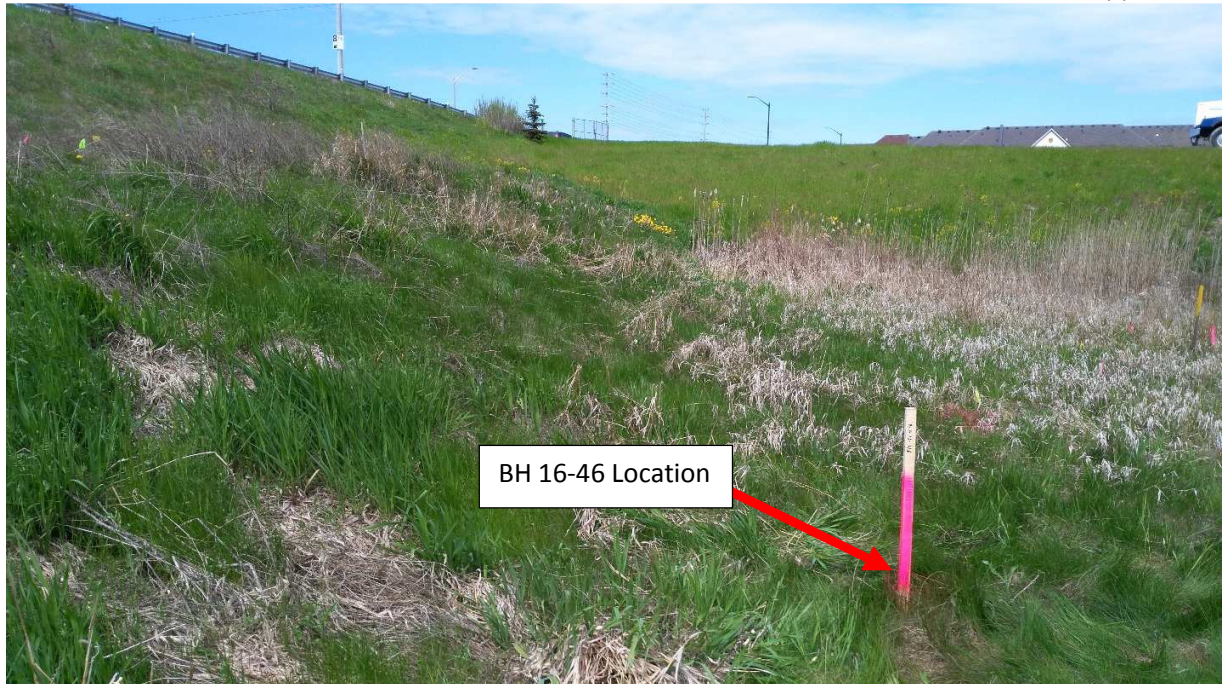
Facing North West , near BH16-46 (Sta. 10+050)
